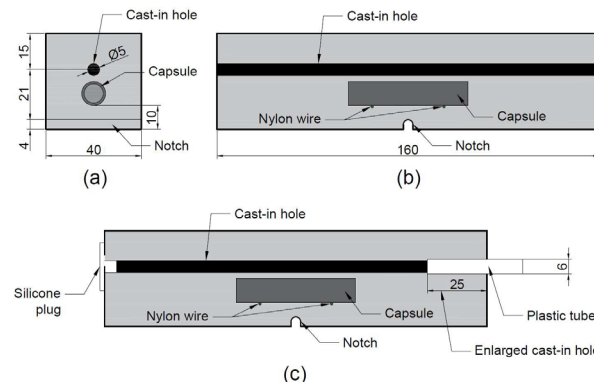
Schematic cross-section of the specimens at the midpoint (a), longitudinal section after casting (b) and after the preparation for the water flow test (c) (dimensions in mm).
